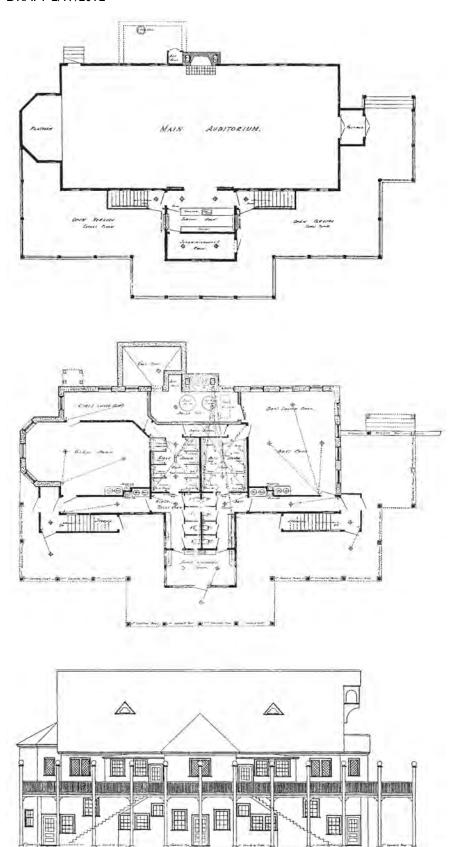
1915 drawings for the proposed design of recreation center. Top: Floor Plan for upper level. Center: Floor Plan for lower level. Bottom: Playground-side elevation. It is unclear whether the shown alterations were ever constructed. (Credit: Newton Historical Society)
